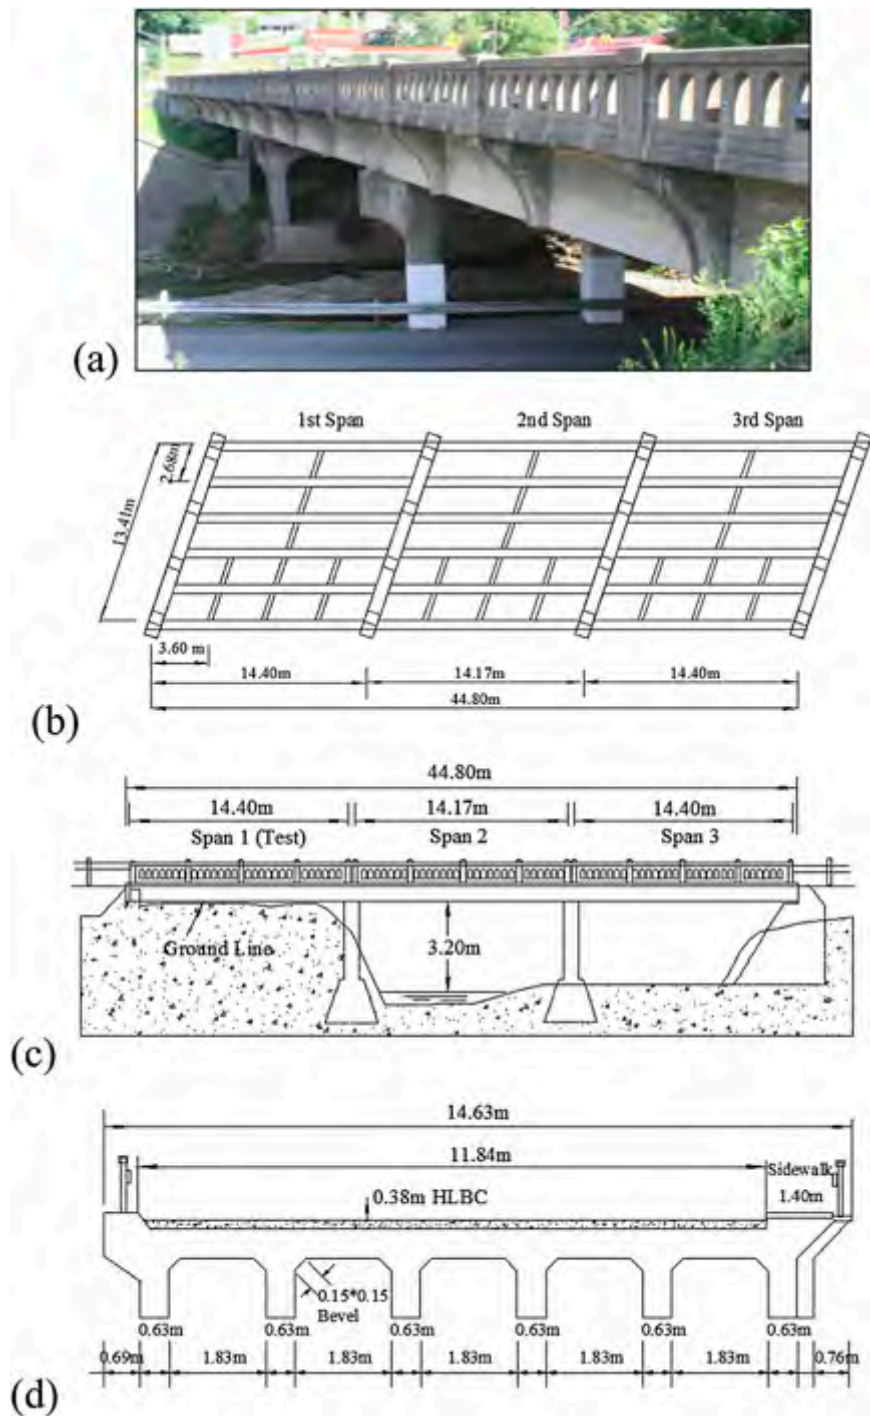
Smithers Bridge: (a) photograph; (b) girder plan; (c) elevation; (d) cross section
